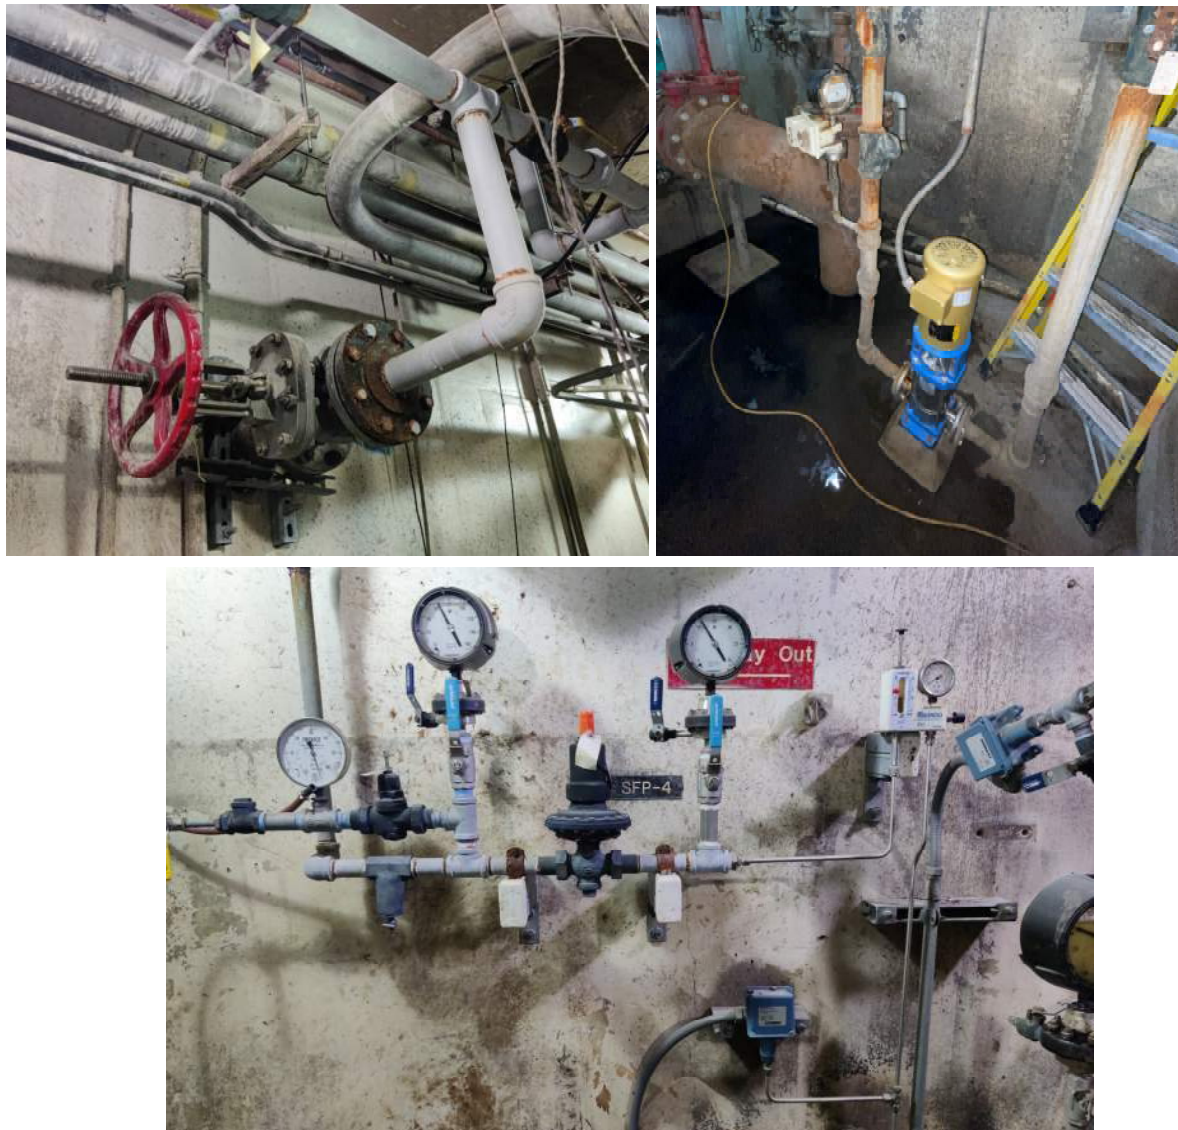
LPSW Feed (top left), Booster Pump (top right) and Seal Water Assembly (bottom)
